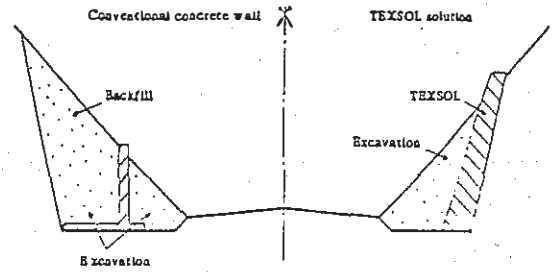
Comparison of concrete wall and TEXSOL solutions for retaining structures.
